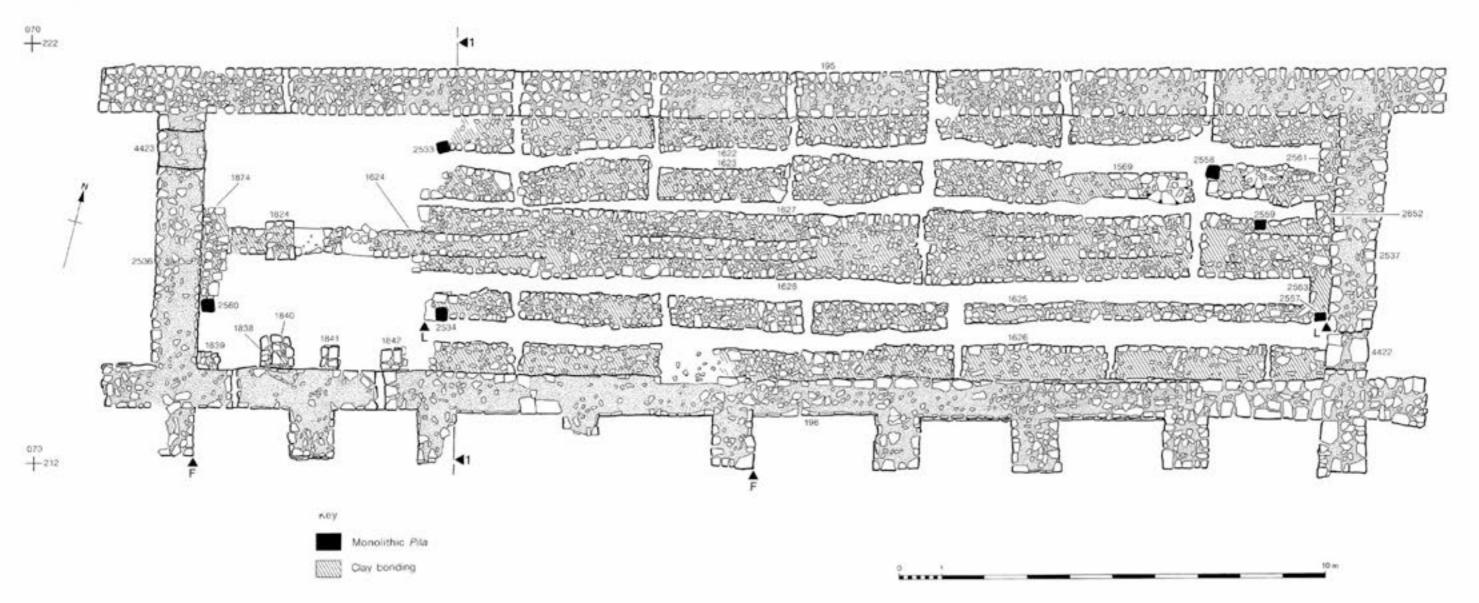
Plan of Building 198, the north horroum at Phase c, with locations of Elevations F, L
